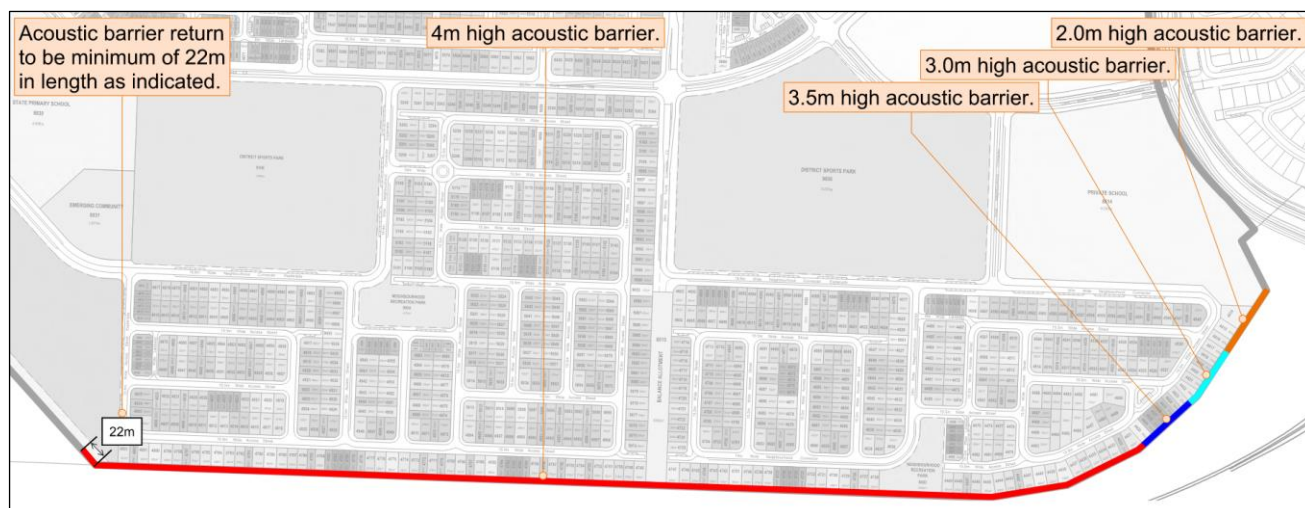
Proposed Bells Creek Arterial Road acoustic barrier (Southwest Section – P19)
